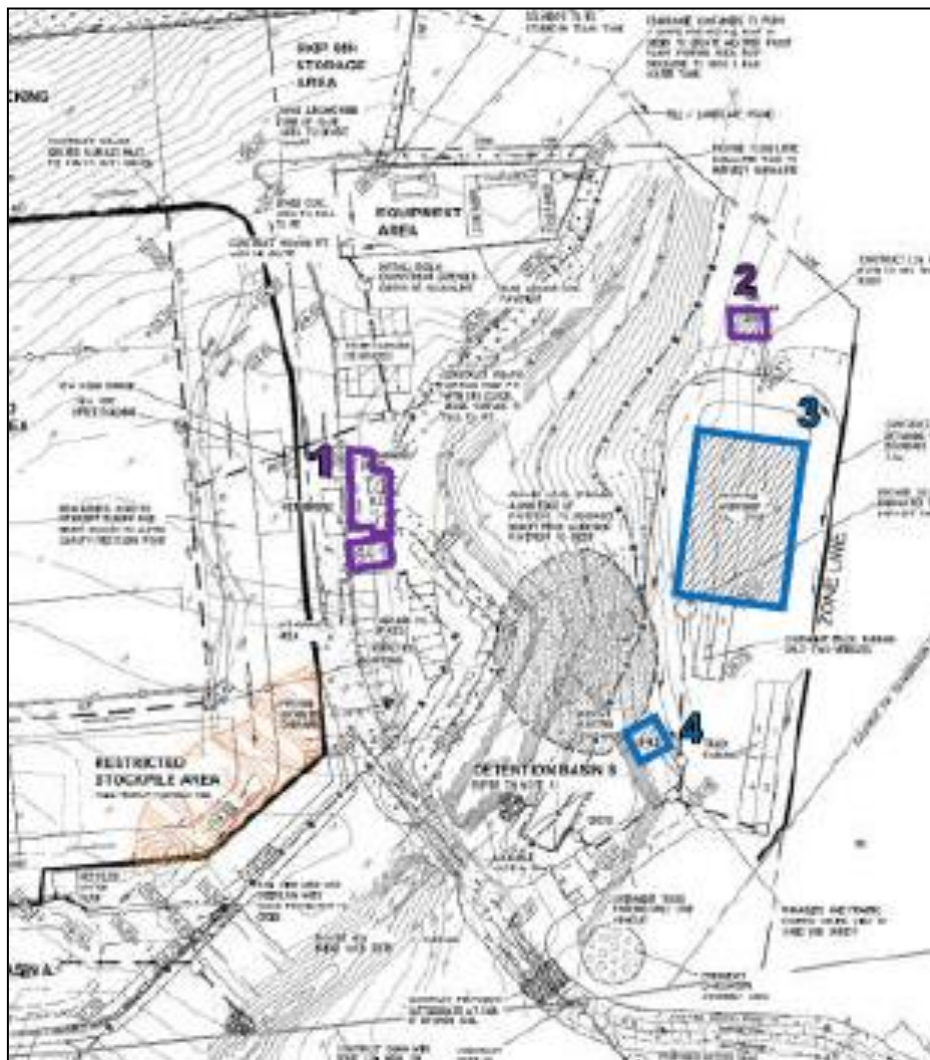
Layout of Proposed Development (showing building references as contained in Bushfire Protection Assessment)
